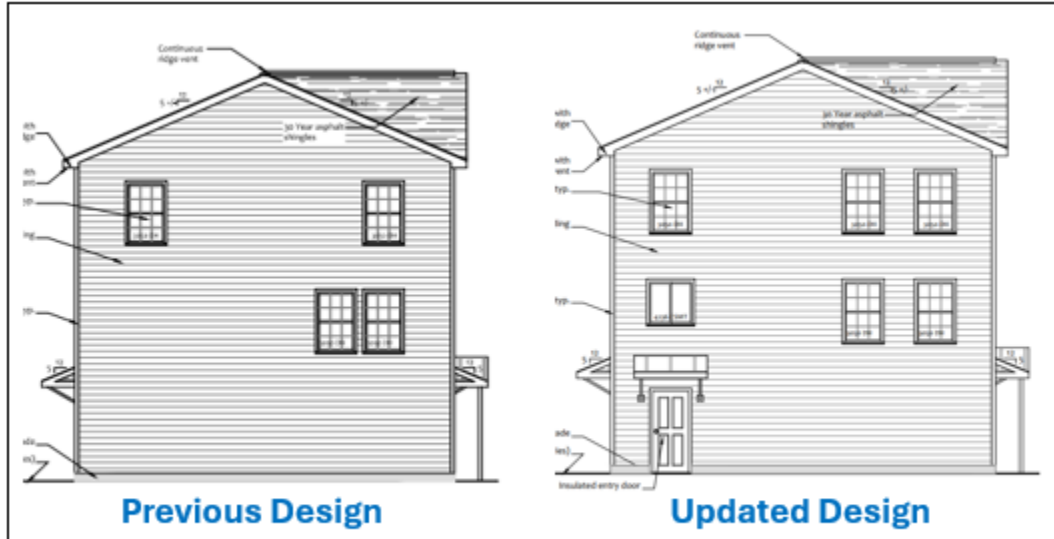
Snippets showing the previous proposed design for the street-facing building facades and the updated design.
